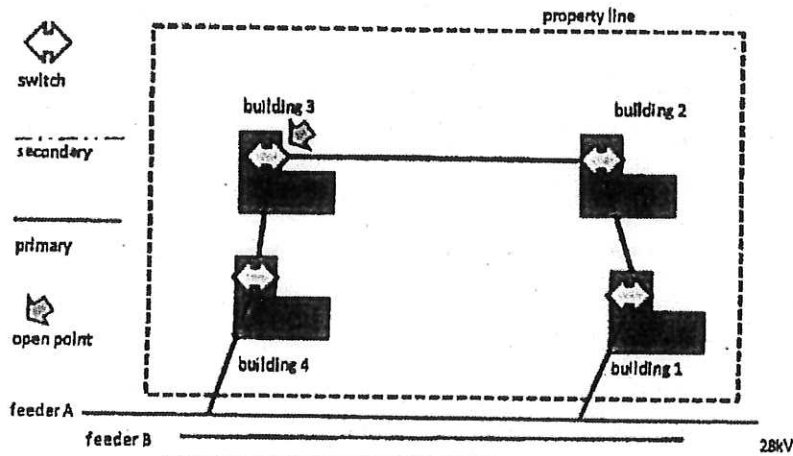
DRY TYPE TRANSFORMERS greater than 1,000kVA
